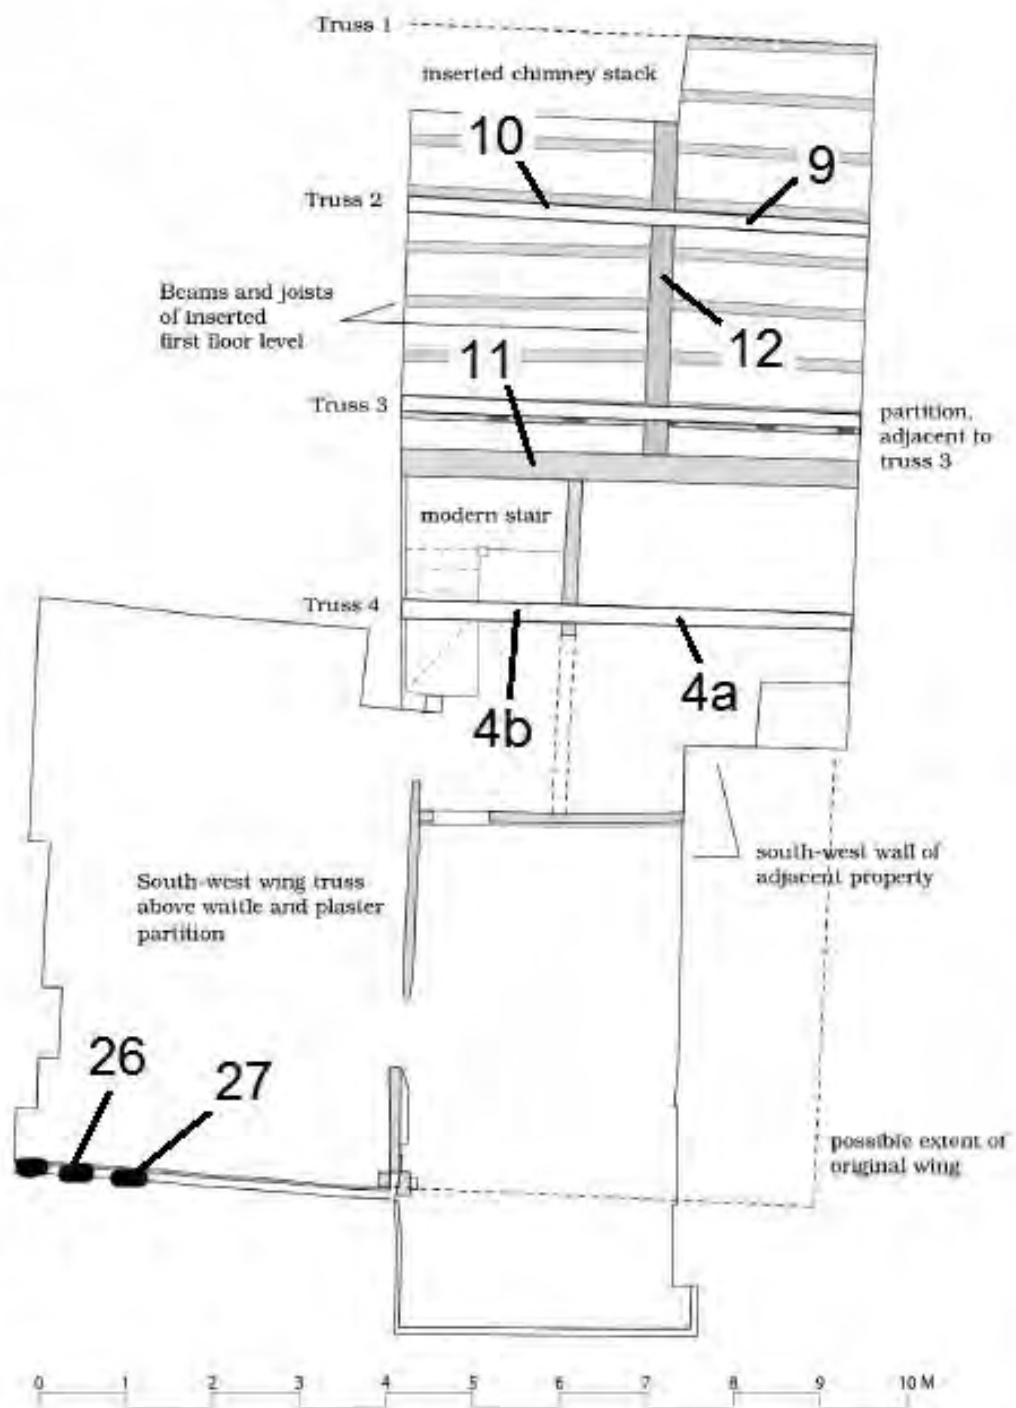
West side internal elevation showing some the timbers sampled for dendrochronology (adapted from original drawings by David Longley)
